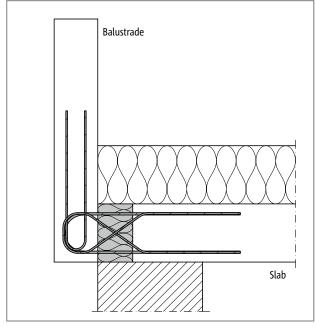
Schöck Isokorb® XT type F: Connection to a corbelled sill for thermally insulated brickwork
